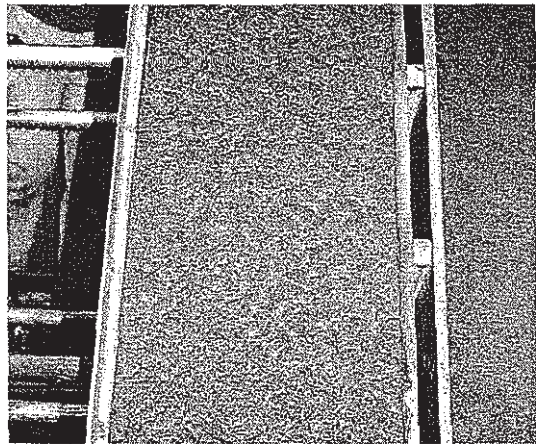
State of the reinforced specimen (sandy soil with 0.2% short fibers)
